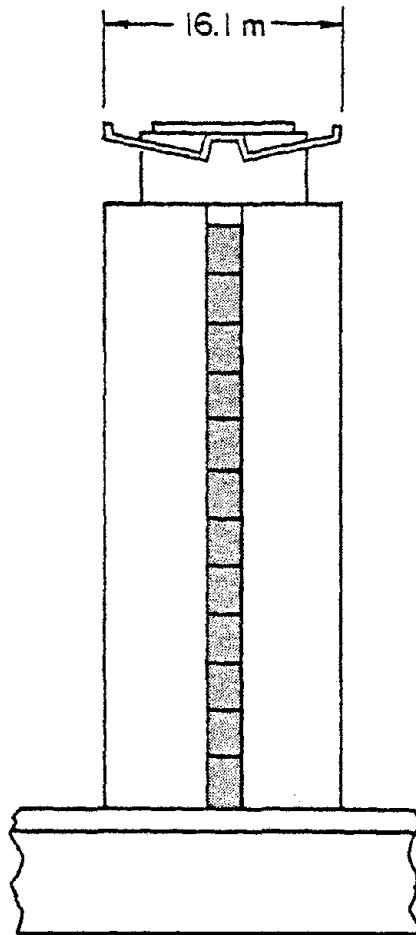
Elevation View of the Civic Center in the Short Direction.
